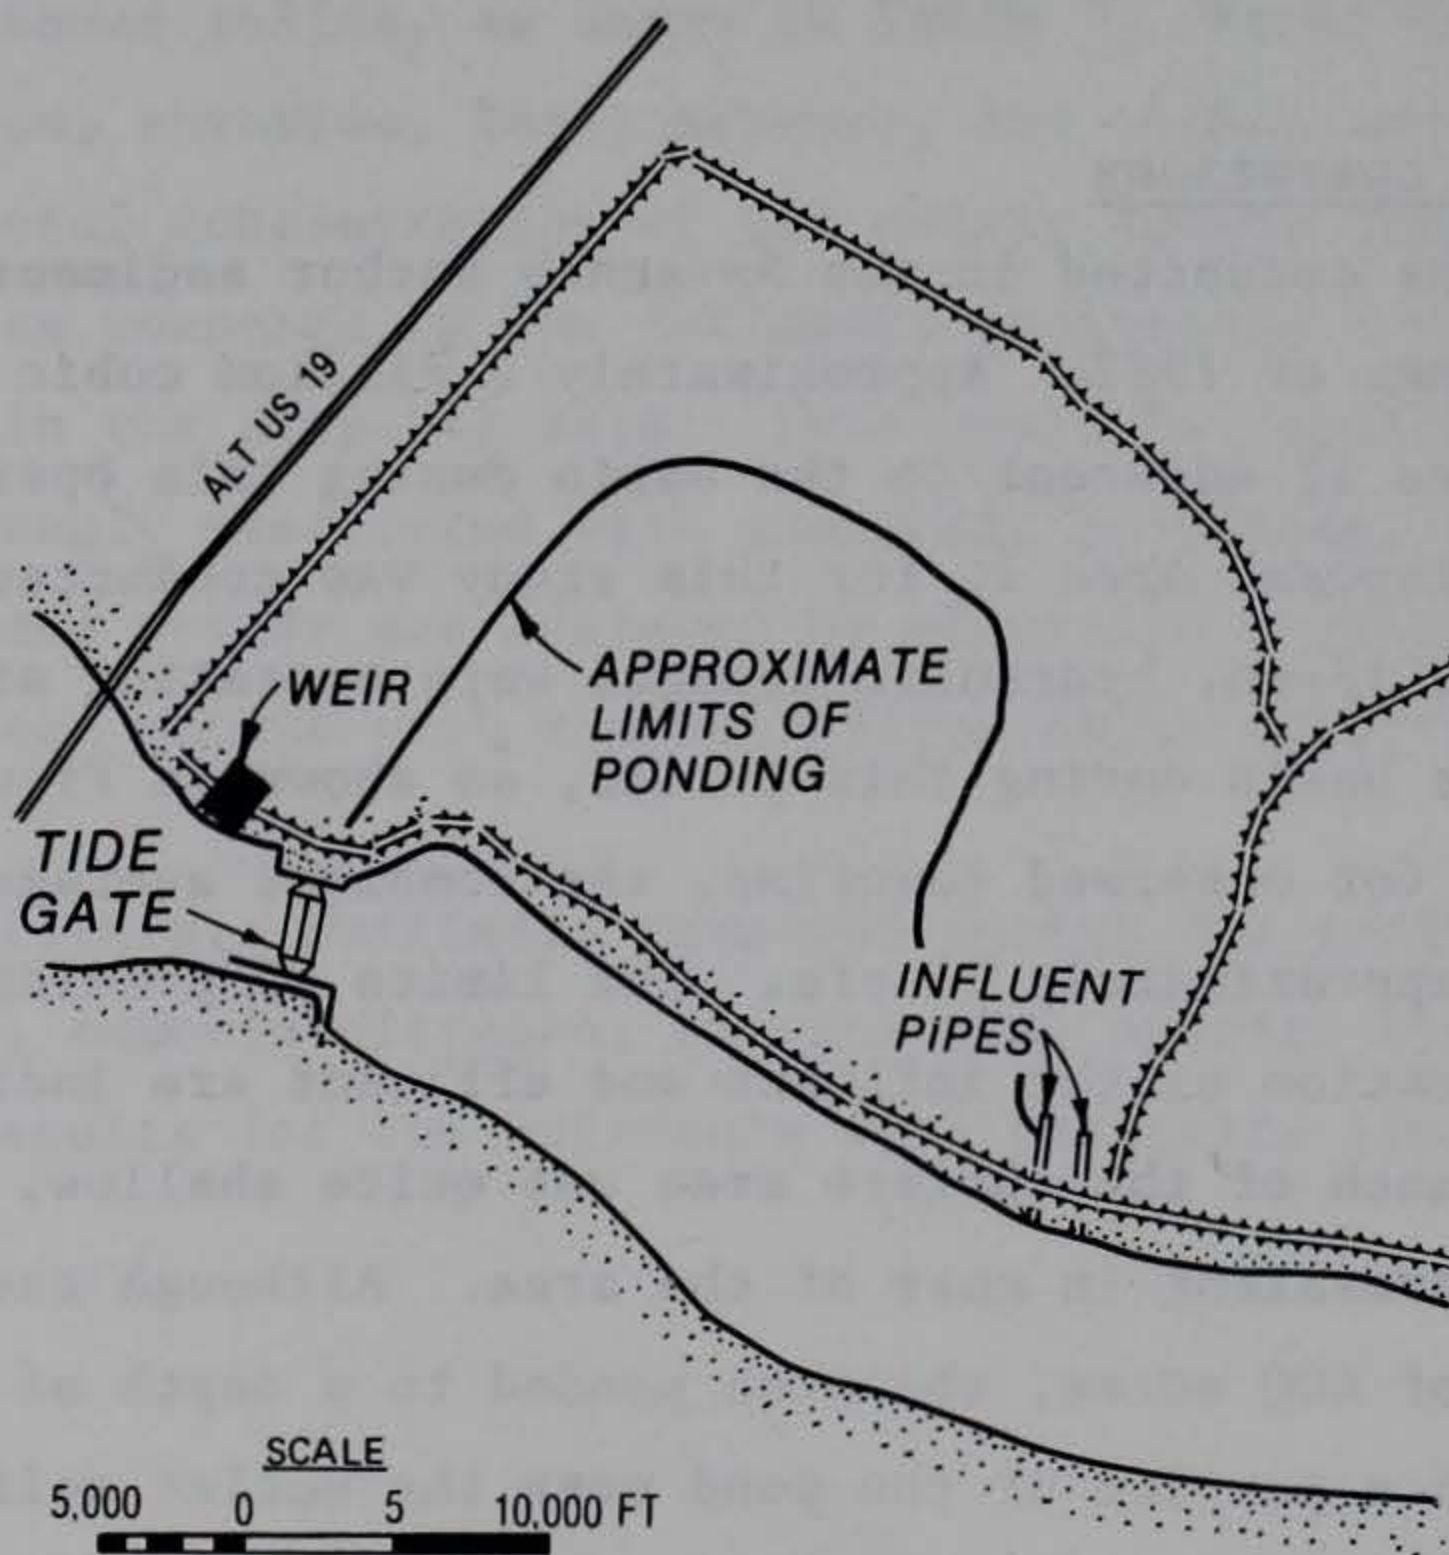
Plan of Disposal Area 12, Savannah Harbor
